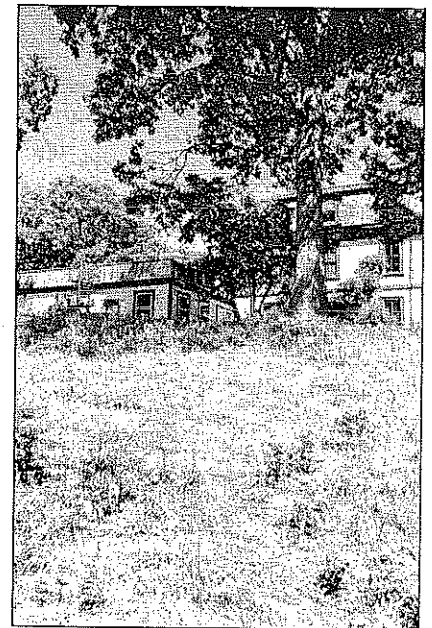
Photograph showing the locations of the proposed drainage pipe for the infiltration chamber and TC-3 and TC-4, view northeast, Stonehurst project area, Waltham, Massachusetts.
